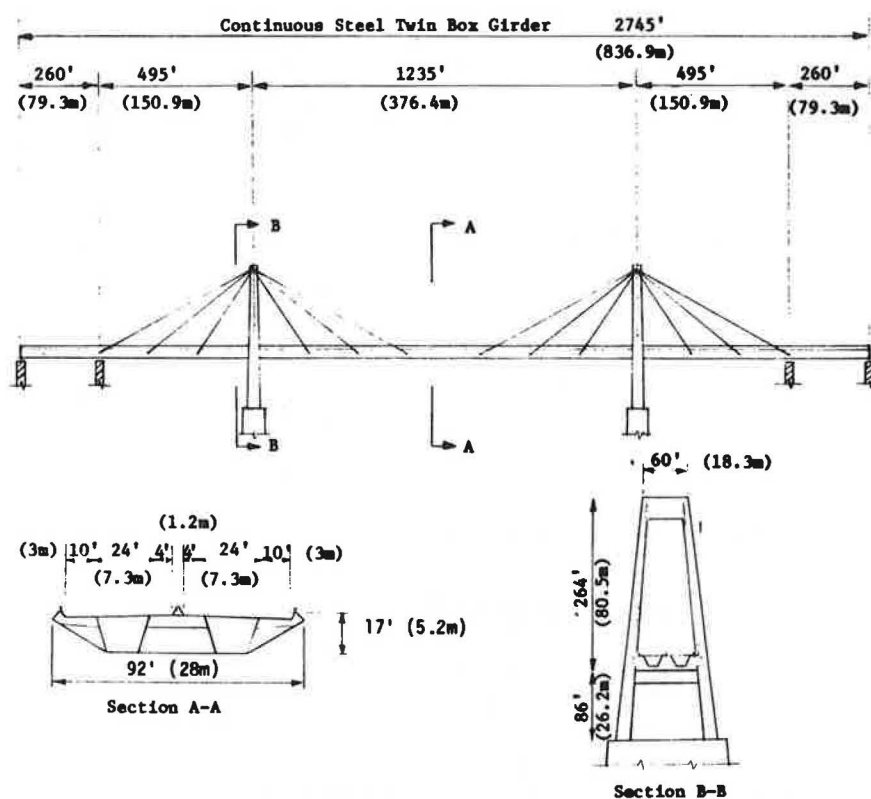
General elevation of prototype - Huntington, W. Va. Bridge.
